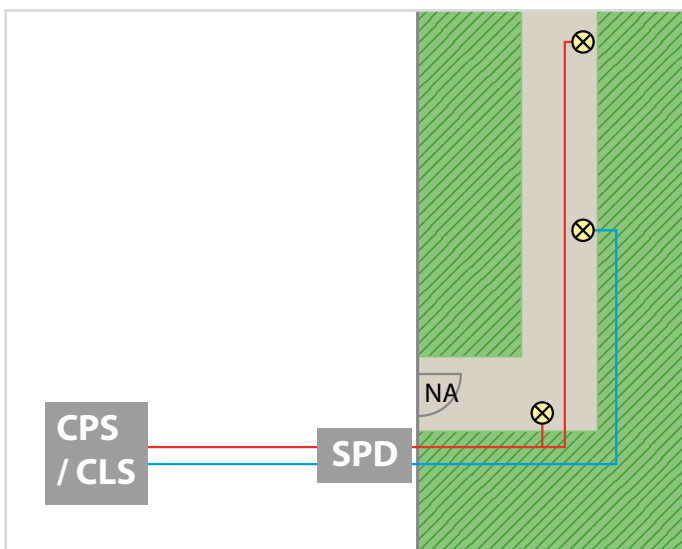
Luminaires on the outside wall of a building can be connected to an emergency lighting circuit nearby. Make sure, however, that the wiring between the last interior luminaire and the outdoor luminaire alternates.
